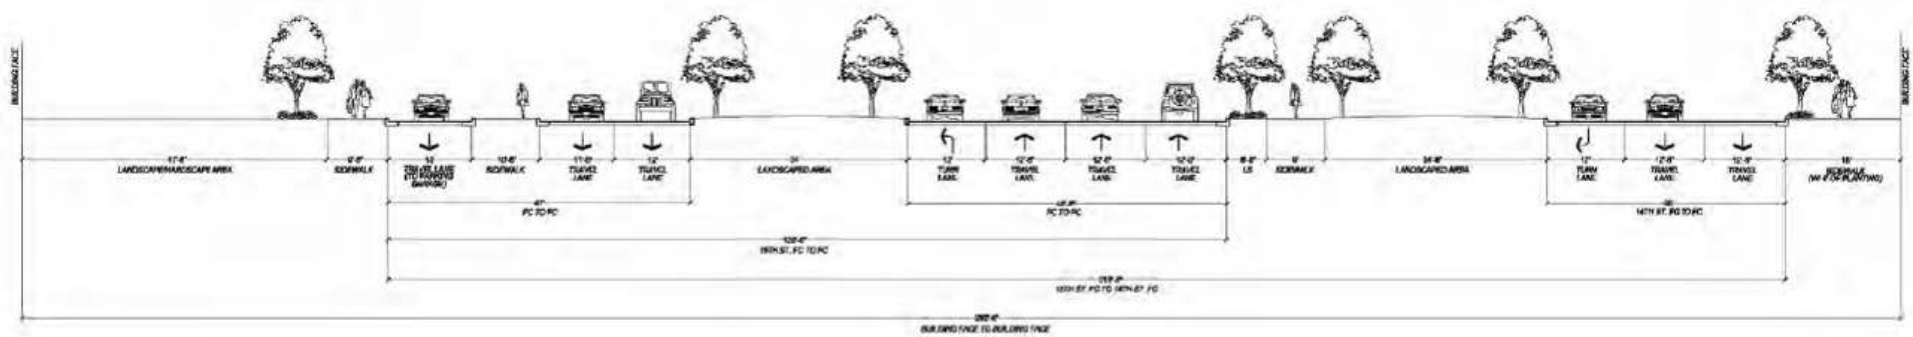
Existing cross-section looking west of 15th Street S. and 14th Street S. to the west of Jefferson Davis Highway
